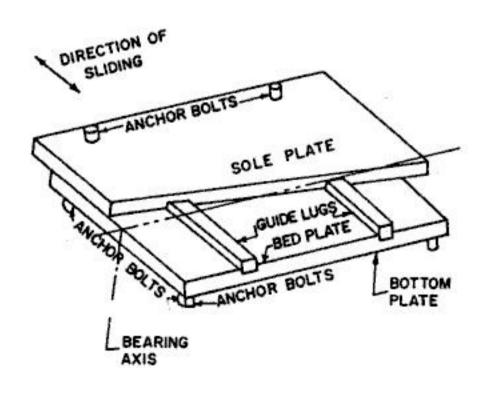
ELEMENTS OF SLIDING BEARING
